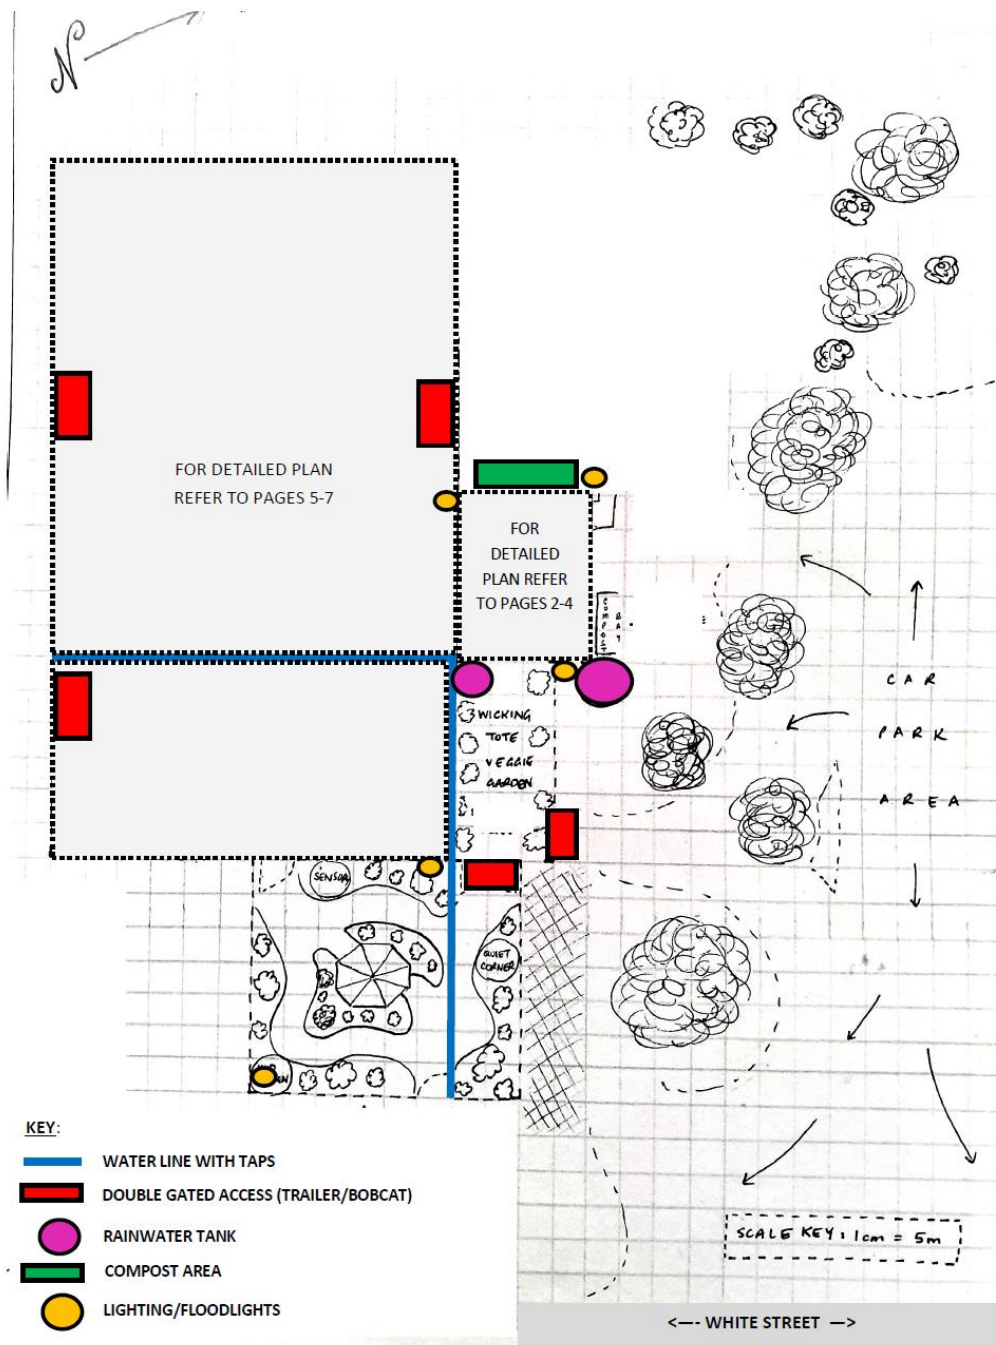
‘Revised Plan’ – 2020 for proposed Community Garden
